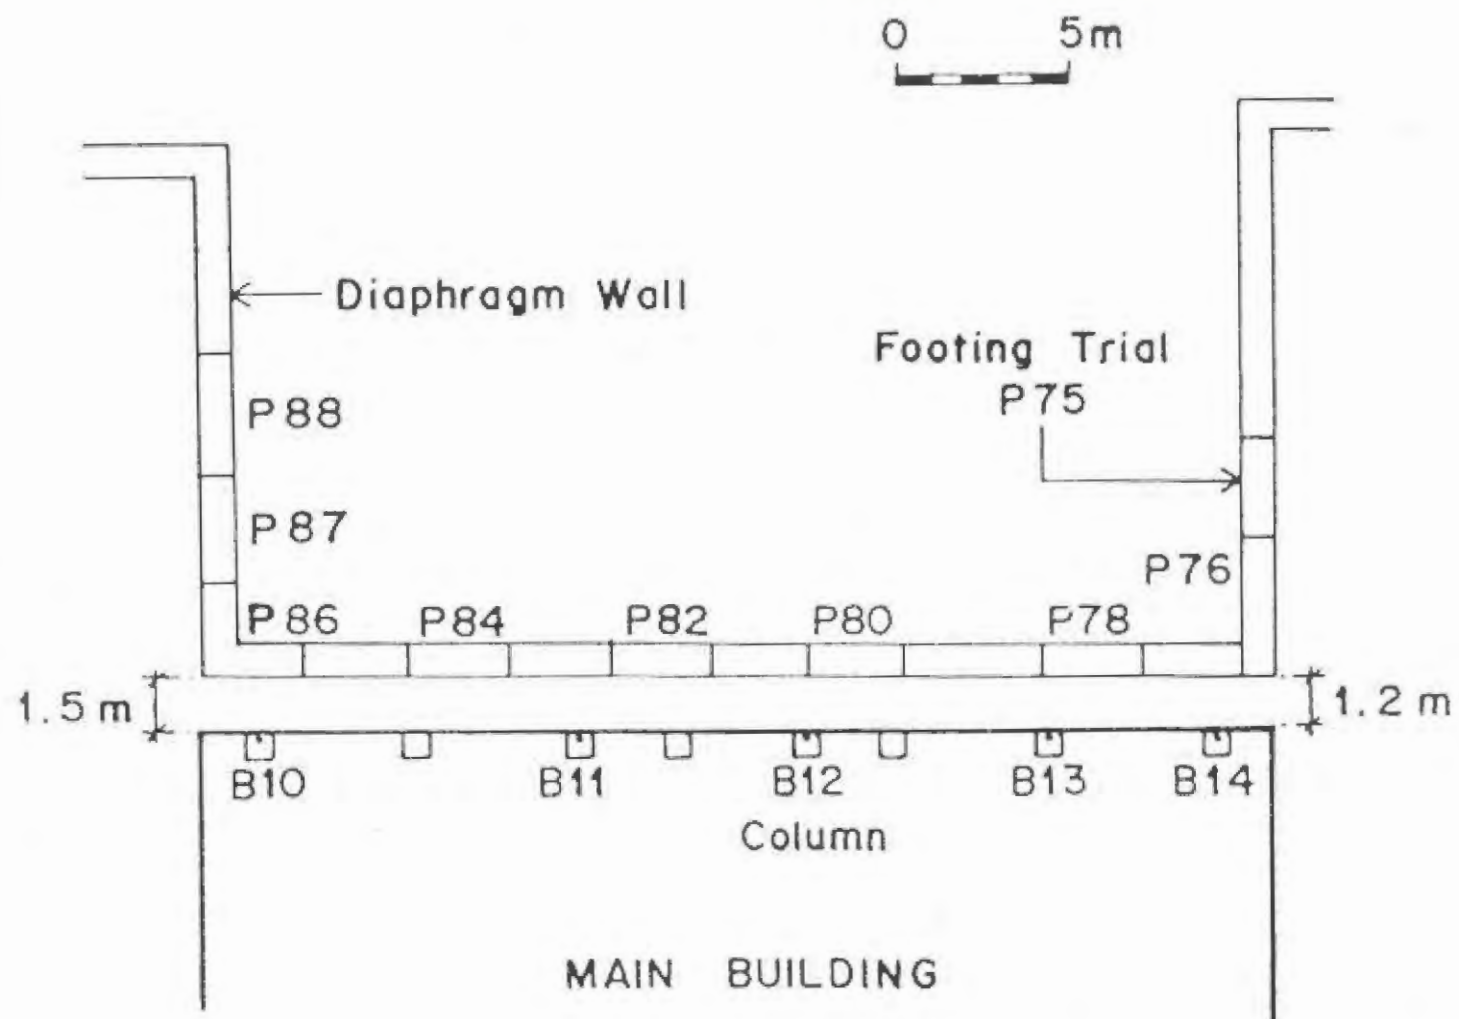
Diaphragm wall adjacent to Main Building.
